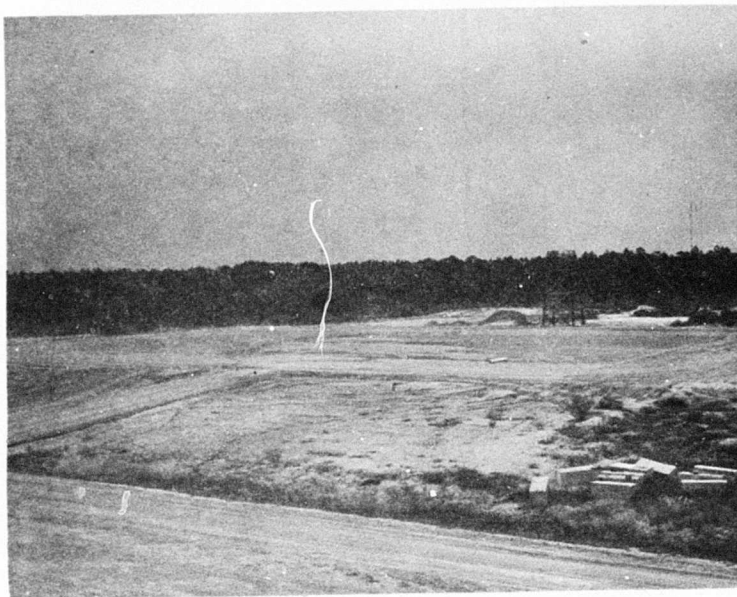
Completed BDR Test Site: Note viewing tower near center rear of test pad
